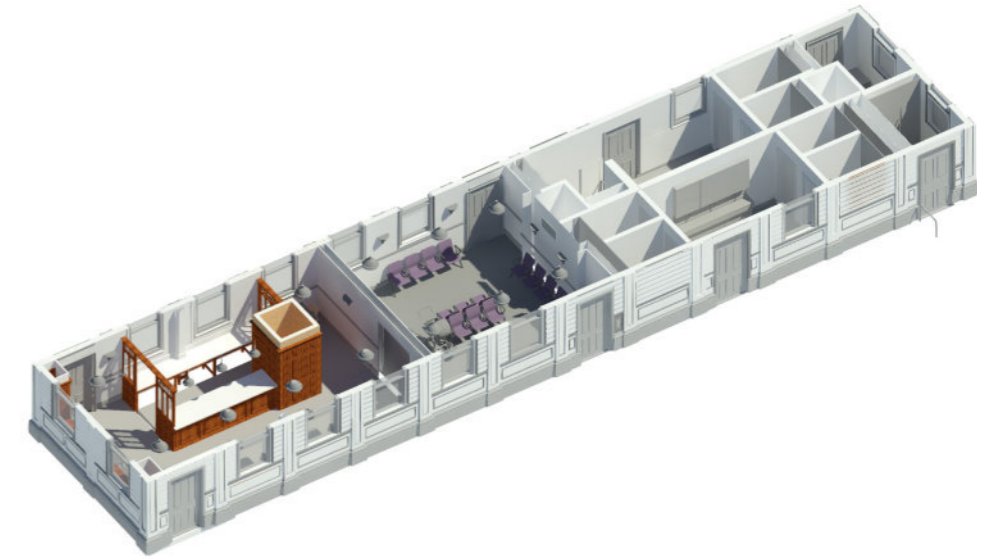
Proposed Tea Rooms 3D model, showing accessibility
